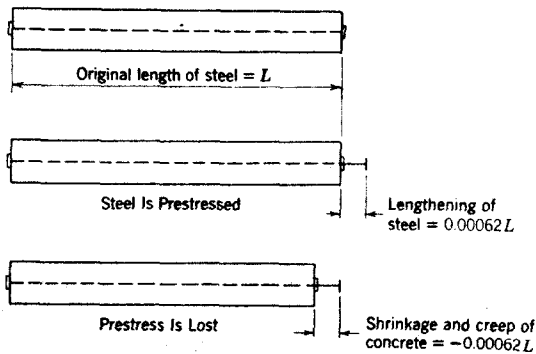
Prestressing concrete with ordinary structural steel.
